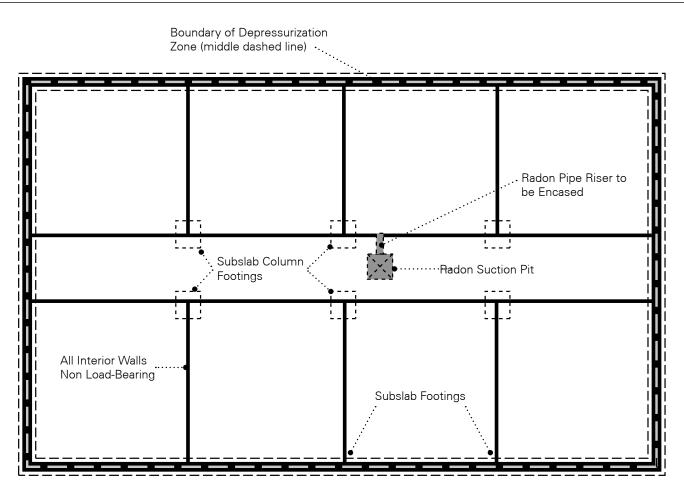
Use of Post-and-Beam Construction with No Interior Weight-Bearing Walls to Minimize Sub-Slab Barriers to Airflow (Plan View) Adapted from EPA (1994).
